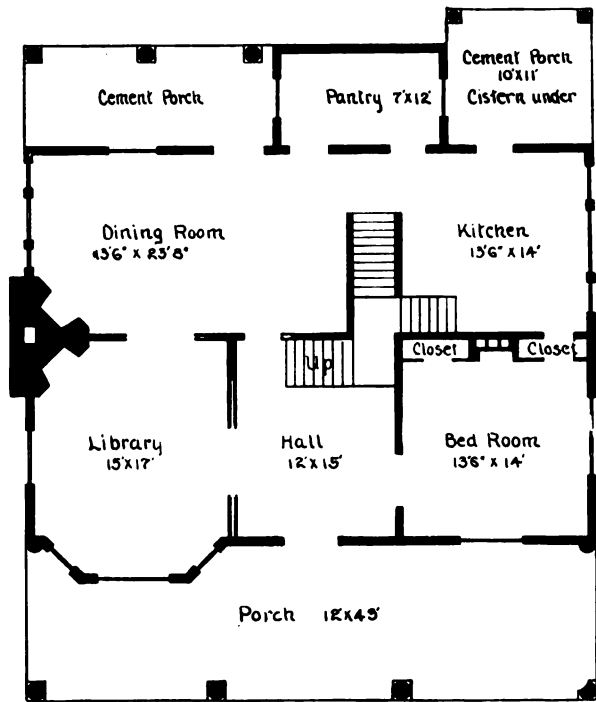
Ground-floor plan of dwelling shown in Fig. 290.
